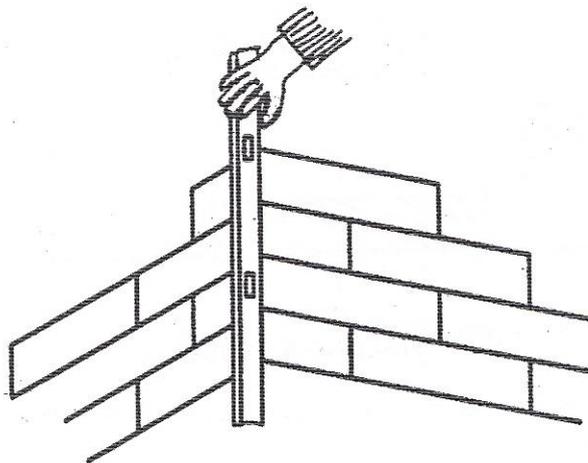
Leveling & Plumbing First Course of Blocks For A Wall
